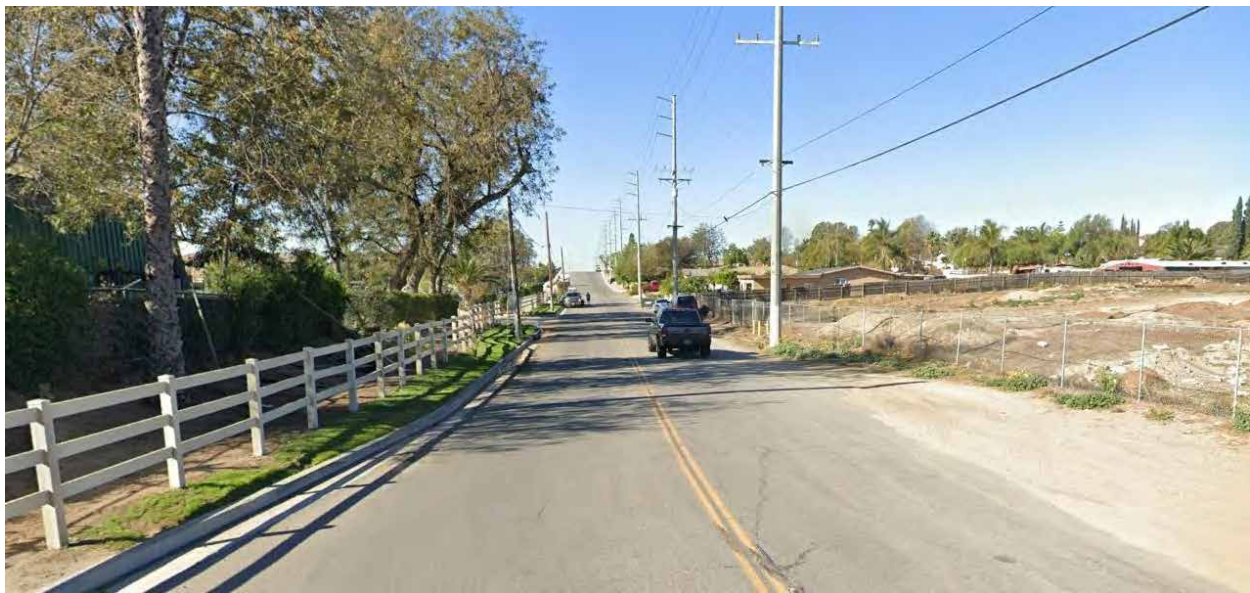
Wineville Road from Cantu Galleano Ranch Road to Landon Drive/Redbud Lane, looking north
